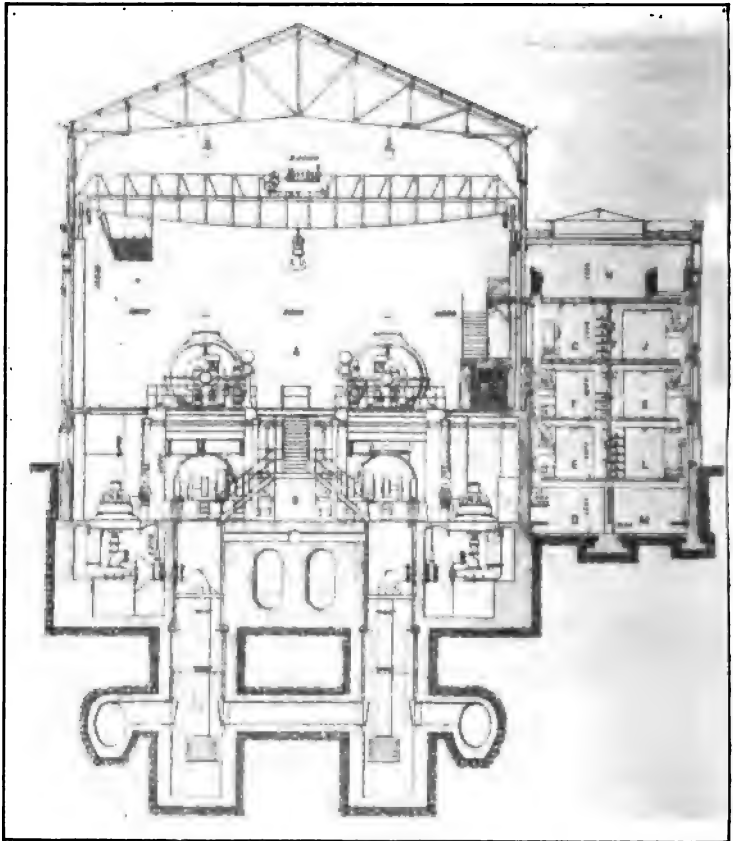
CROSS-SECTION OF TURBINE ROOM AND SWITCH HOUSE, ST. DENIS STATION
